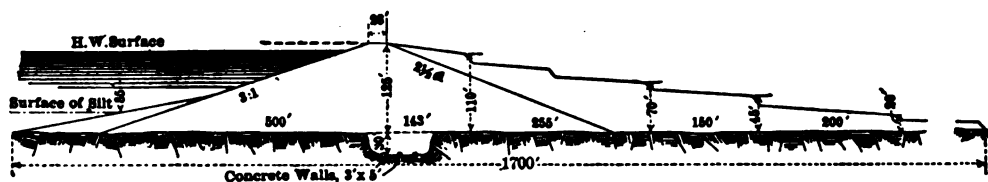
DEVELOPED SECTION OF SAN LEANDRO DAM.
